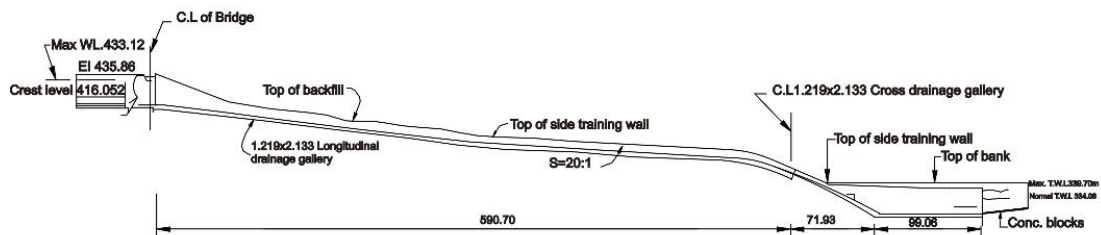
MAXIMUM NON-OVERFLOW EMBANKMENT DAM SECTION OF PONG PROJECT
